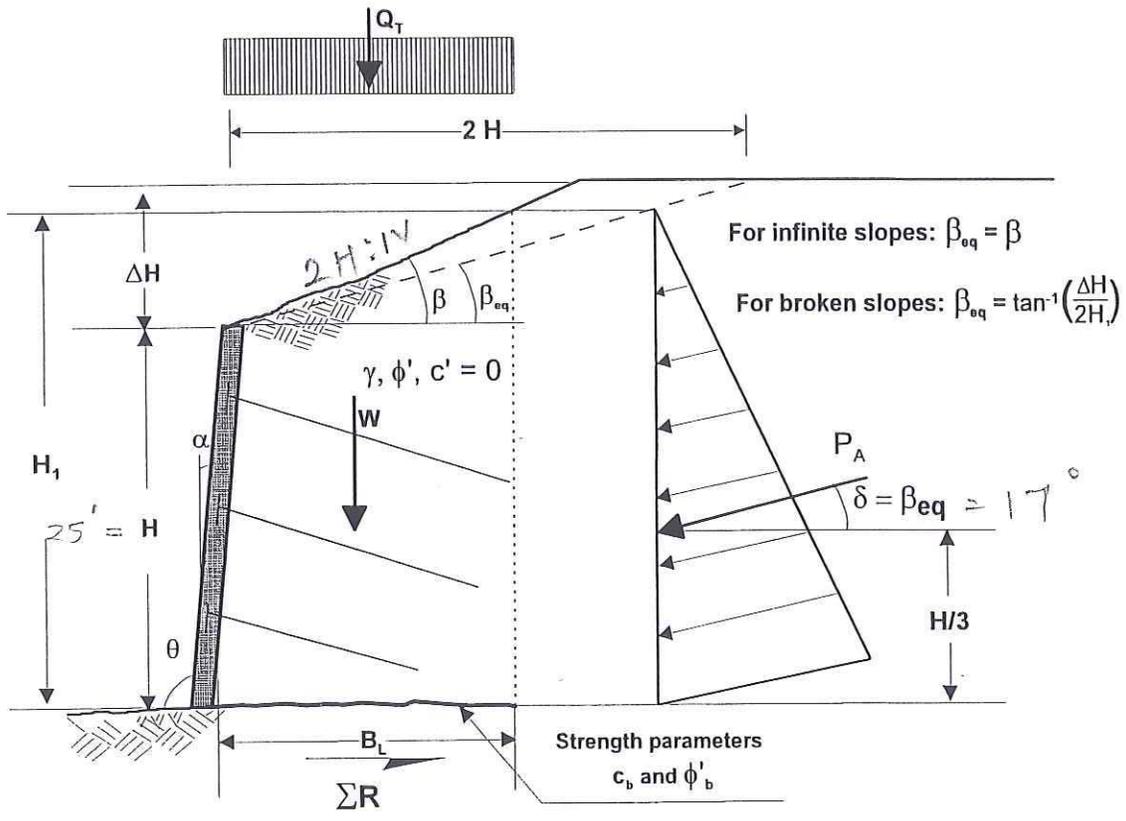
Sliding Stability of a Soil Nail Wall.
